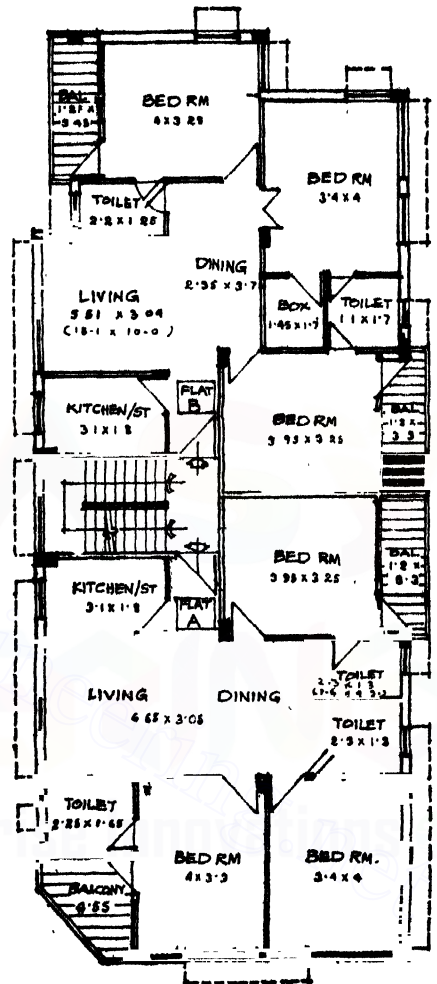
TYPICAL FLOOR PLAN OF A MULTI-STORIED BUILDING WITH TWO BED 3-ROOMED FLATS PER FLOOR.
